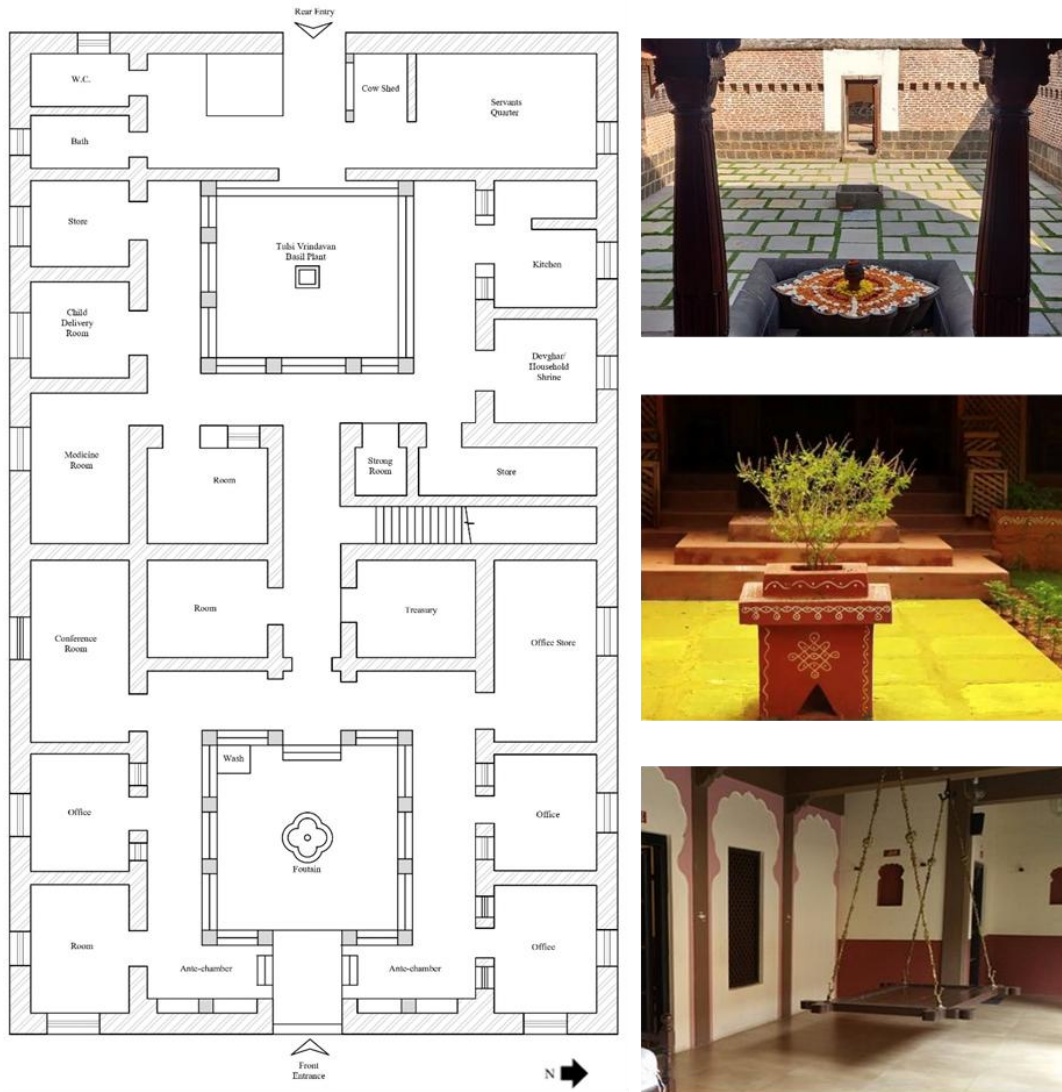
Typical Plan II, Courtyard, Tulsi Vrindavan/ Basil Plant, and Swing (Source: Authors)
